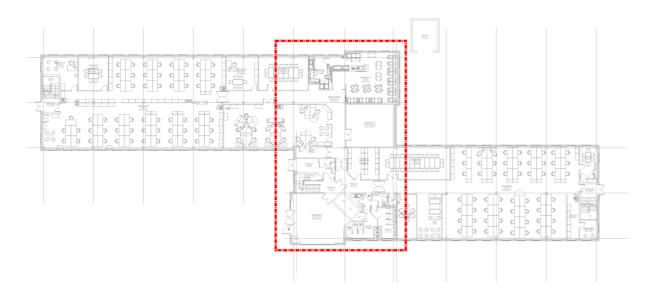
Red dashed line indicates building core areas. Offices/meeting rooms within core typically have 4-pipe FCUs. The heating plant and distribution is original. Where visible, pipework is in steel and insulated along its length.
